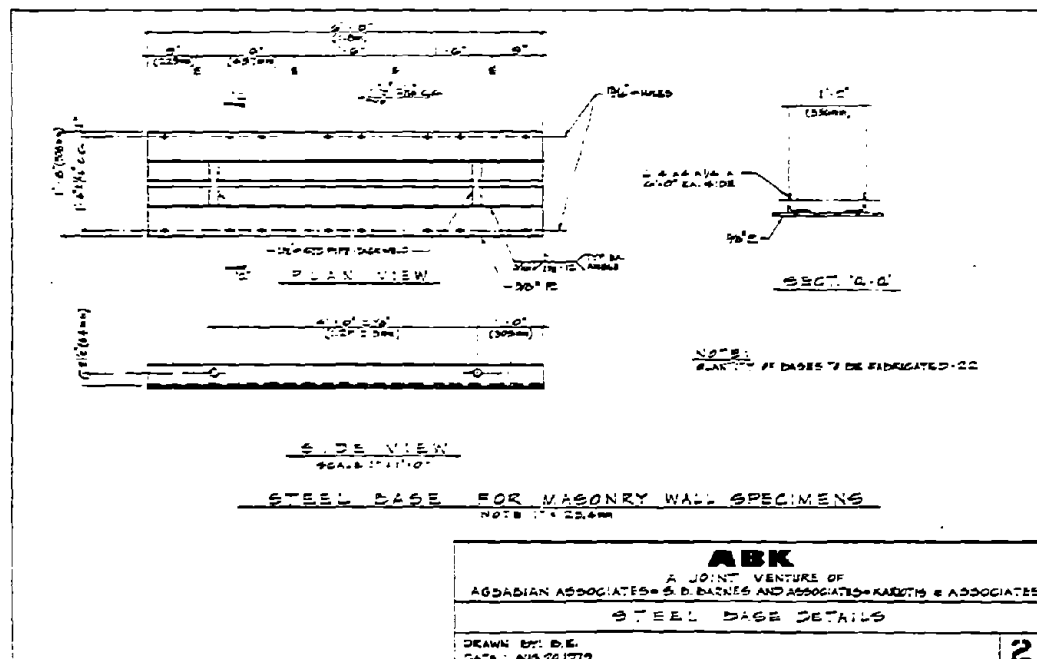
TEST FIXTURE FOR BASE OF WALL
